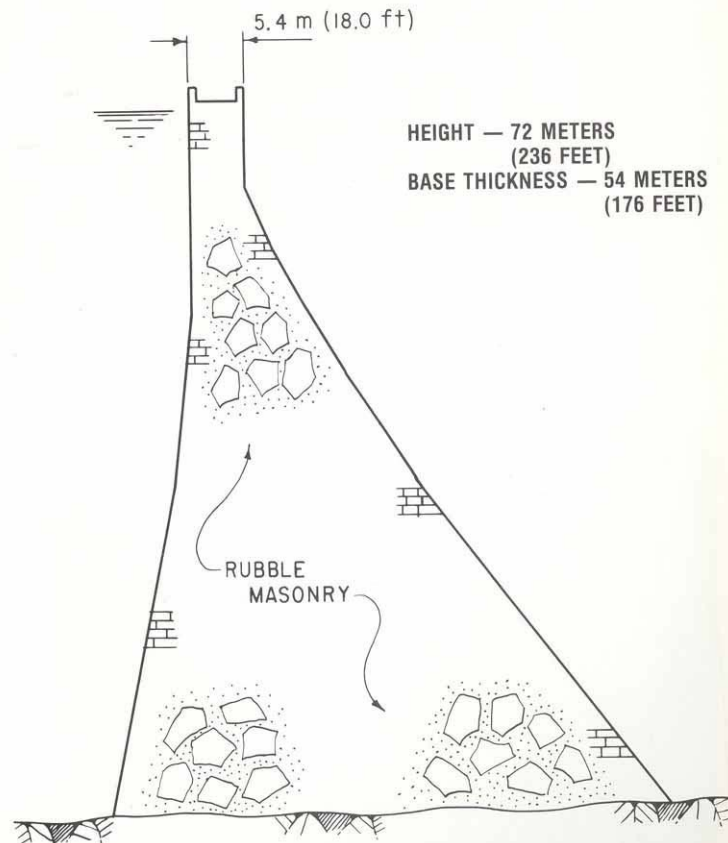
Cheesman Dam, cross section. P-801-D-79314.
